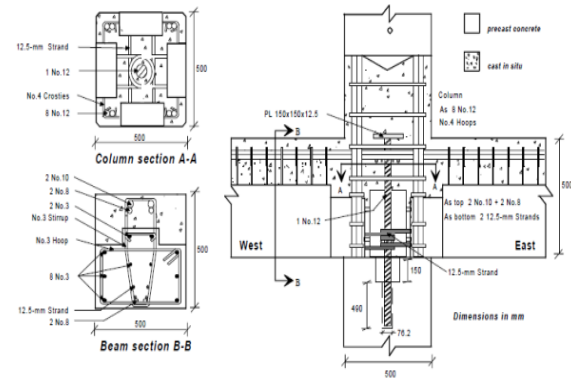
Joint Reinforcement of Specimen J2, EW Direction
